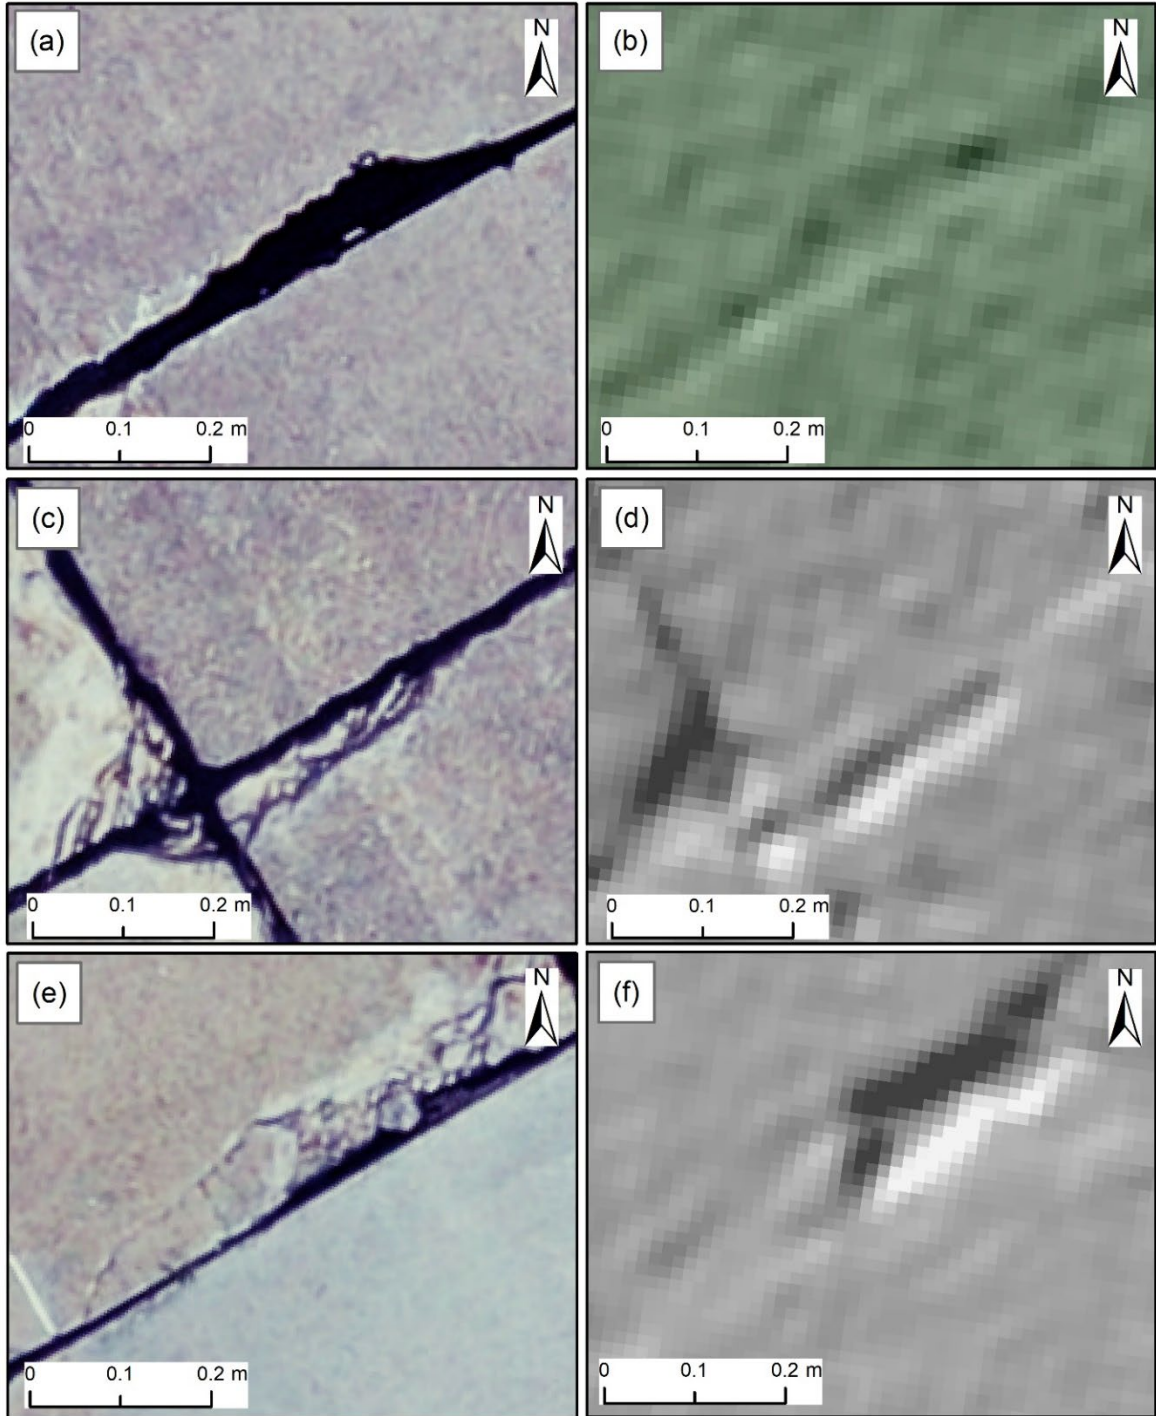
Joint Spalling (L) in (a) 3.2-mm/pix Orthophoto and (b) 12.9-mm/pix DEM; Joint Spalling (M) on Right and Corner Spalling (M) on Left in (c) 3.2-mm/pix Orthophoto and (d) 12.9-mm/pix DEM; and Joint Spalling (H) in (e) 3.2-mm/pix Orthophoto and (f) 12.9-mm/pix DEM
